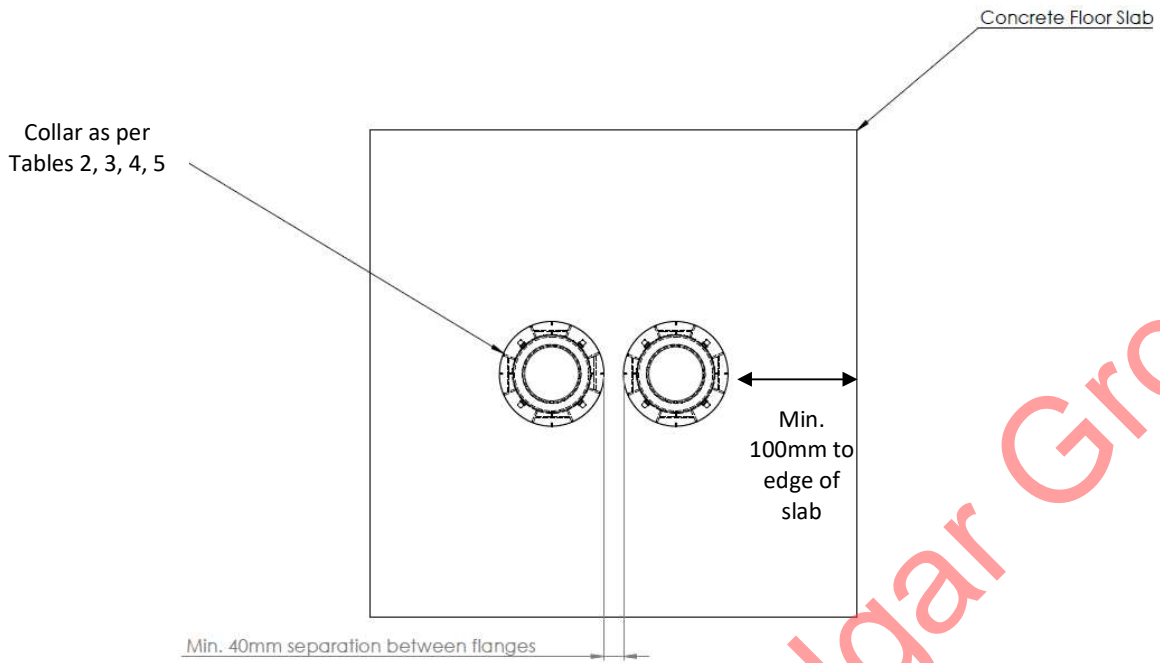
Spacing between adjacent penetrations confirmed to be 40mm (flange to flange)
